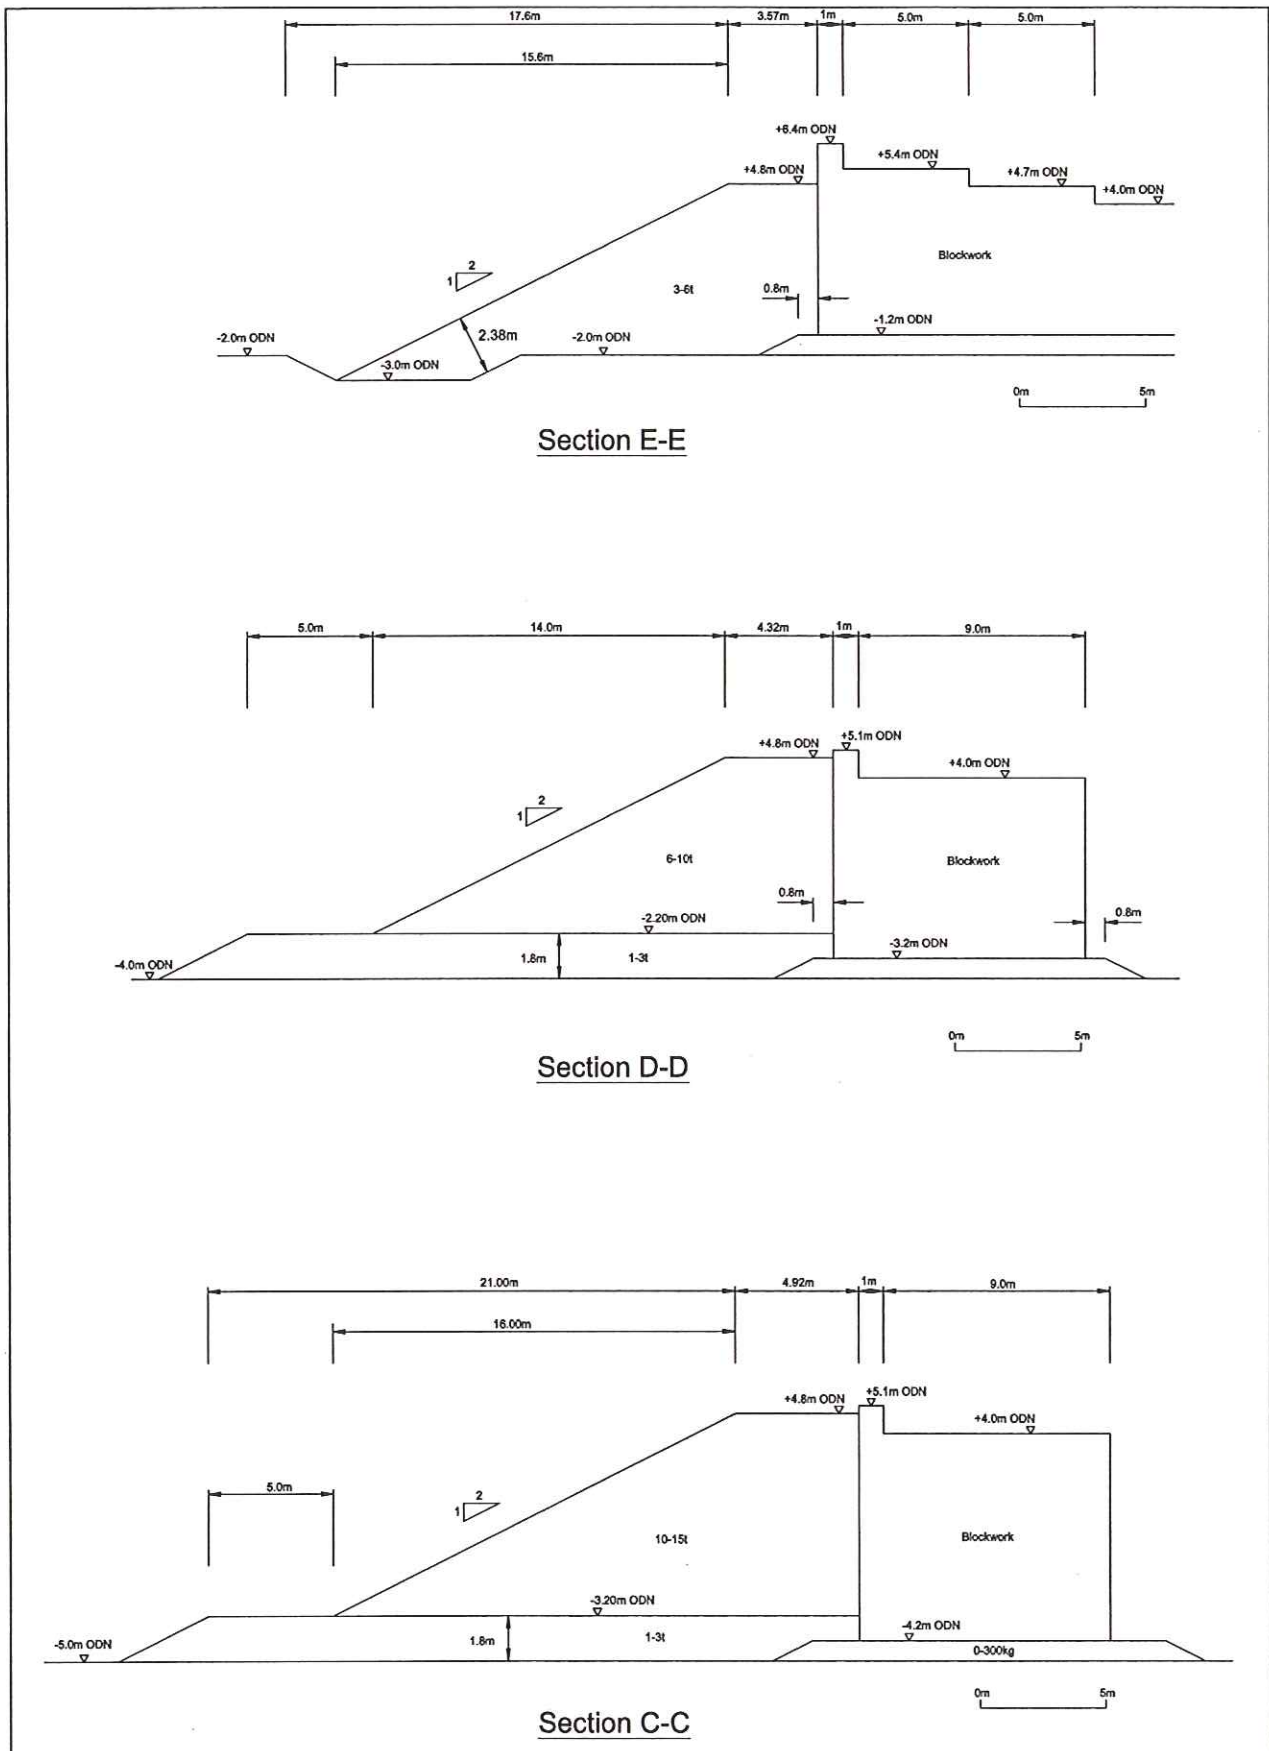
Typical sections through the proposed West Breakwater trunk, Test Series 6
